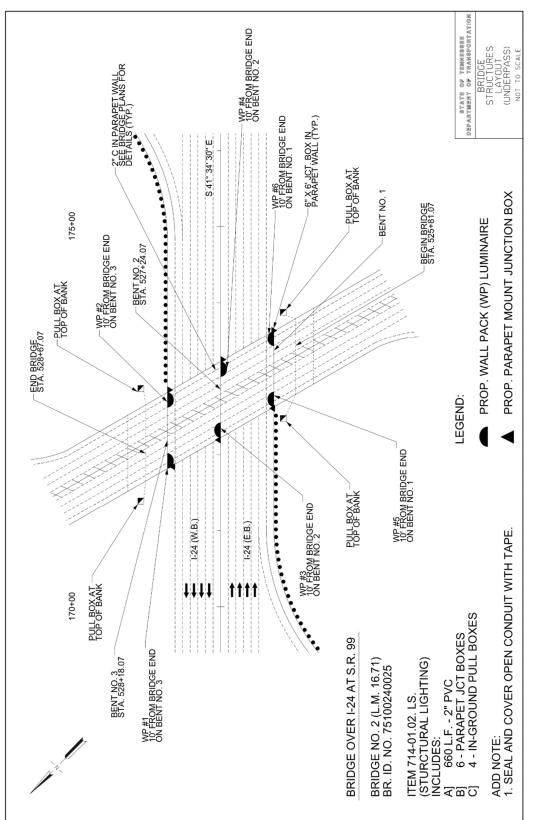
Detail of Underpass Bridge Lighting for Submittal to Structures
